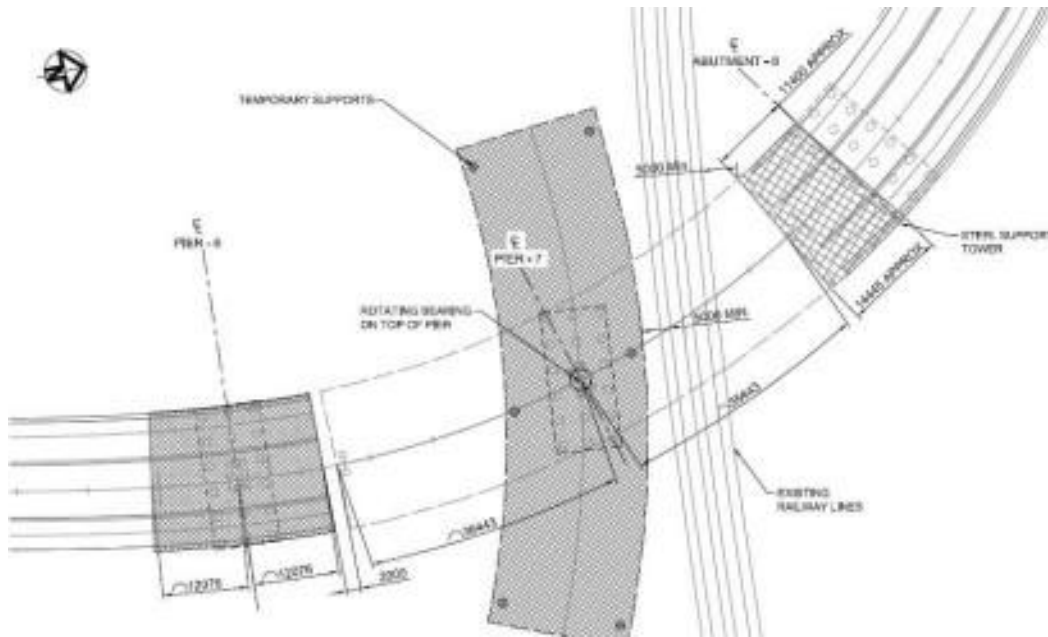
Sketch showing area of cantilever construction parallel to the railway line
